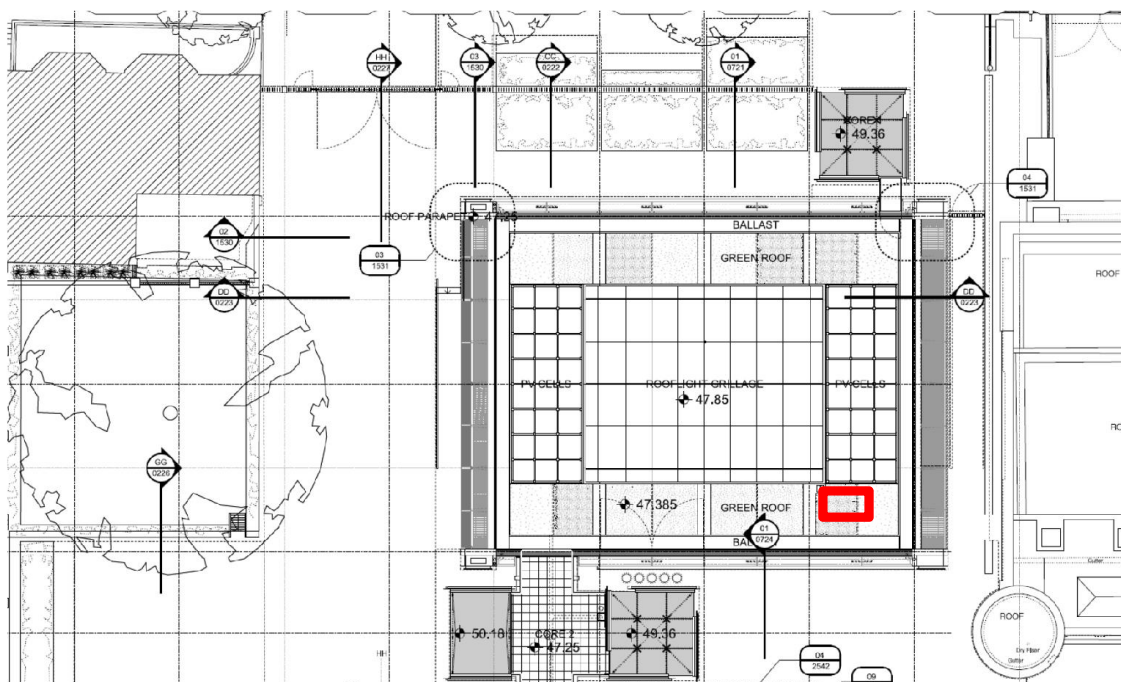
WCEC site plan showing the location of the two bee hives on the green roof substrate
